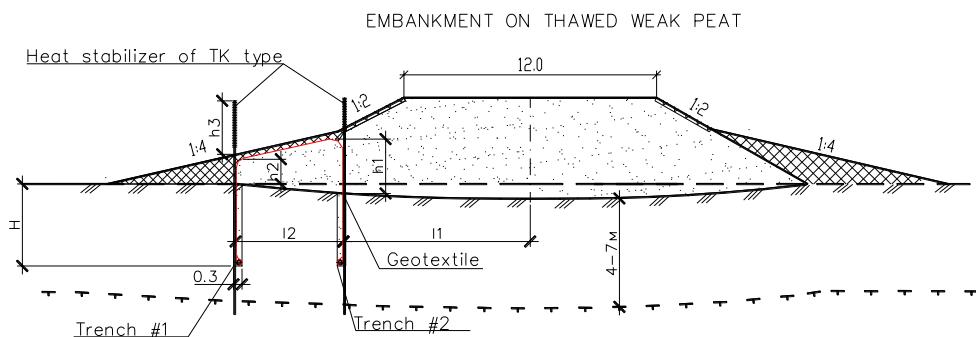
Constructional and technological solution for roadbed stabilization on road section №2 (PK 596+40 – PK 597+00).
